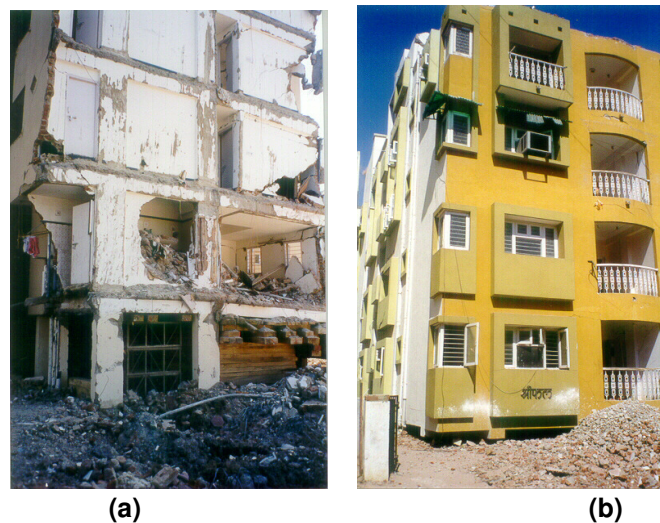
Failure of Buildings in Bhuj Earthquake (a) Masonry Infilled Frame and (b) Soft Story Mechanism of Failure.
